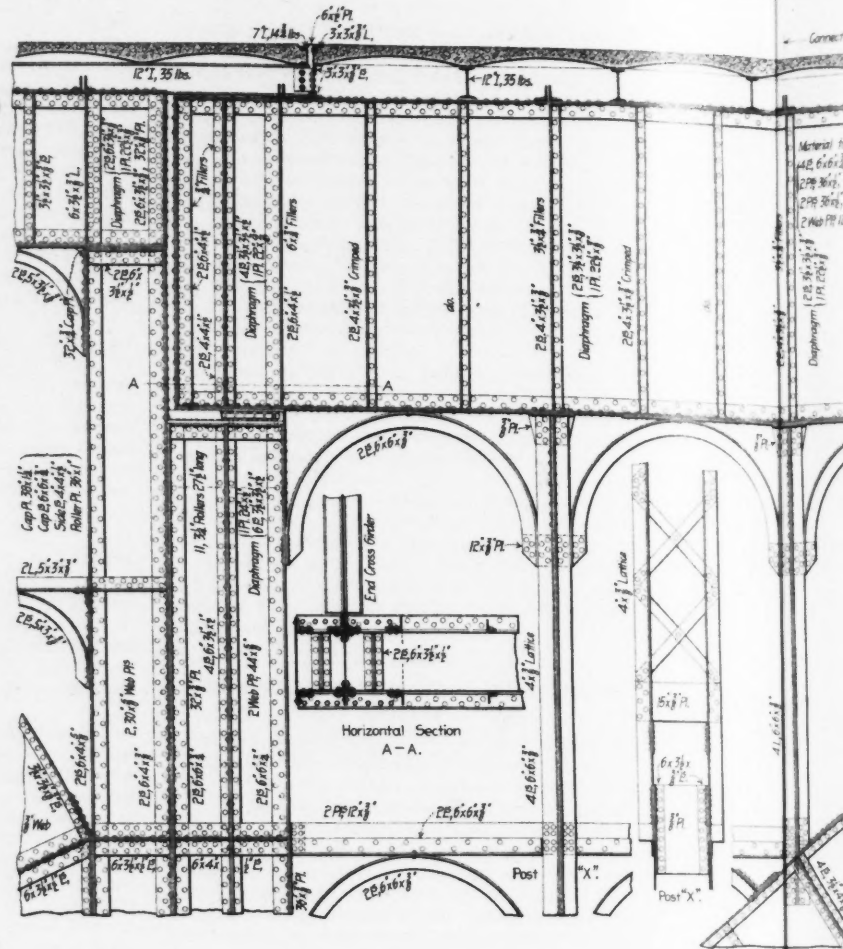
DETAILS OF TOP OF COLUMN, EXPANSION END OF MAIN GIRDER AND SPANDEL FRAMING, 130-FT. SPAN.
